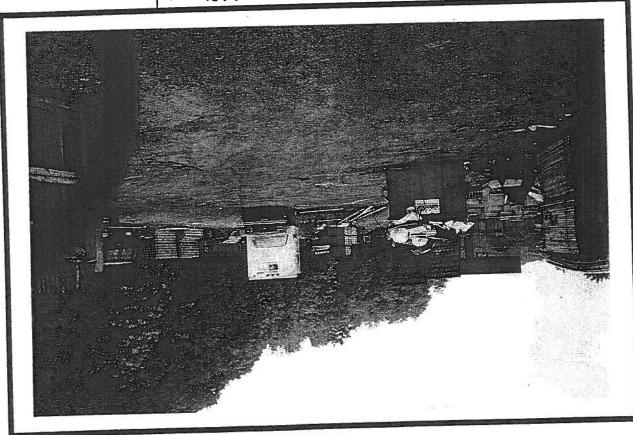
Stockade-Fenced Area Used for Building Material Storage
